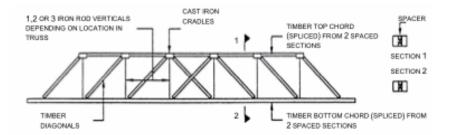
Schematic diagram of an Allan Truss (derived from DMR 1987)
